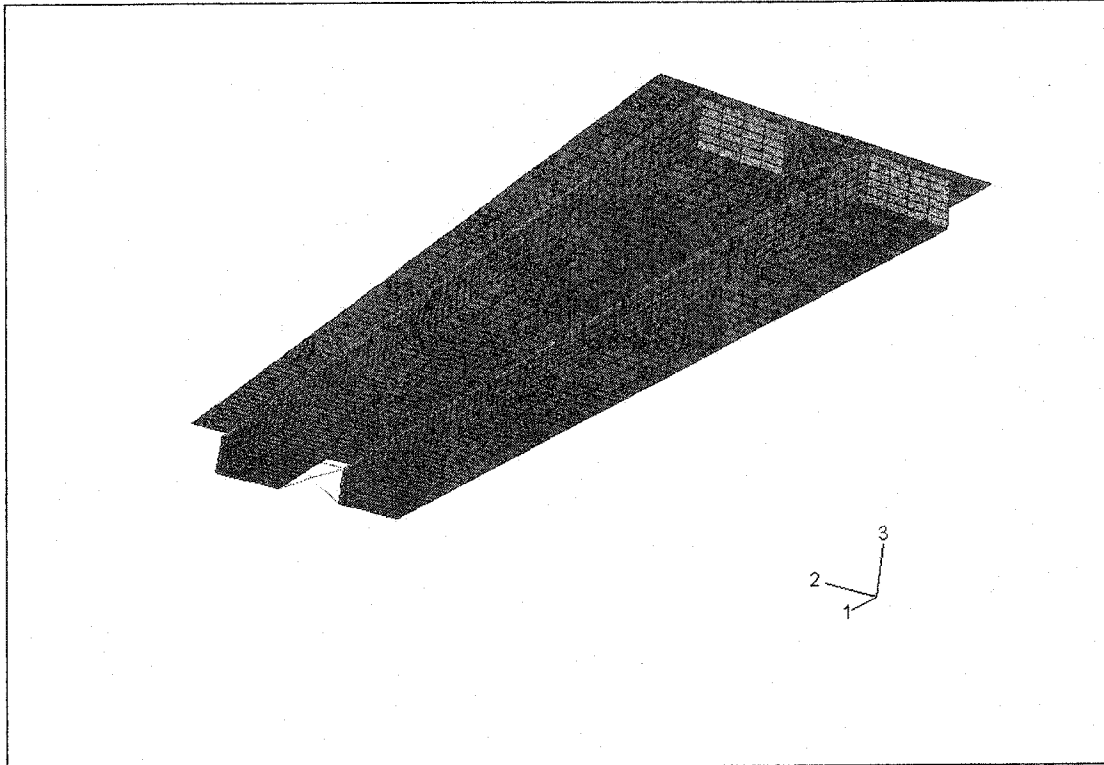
ABAQUS model view of bridge model M3 with concrete deck
